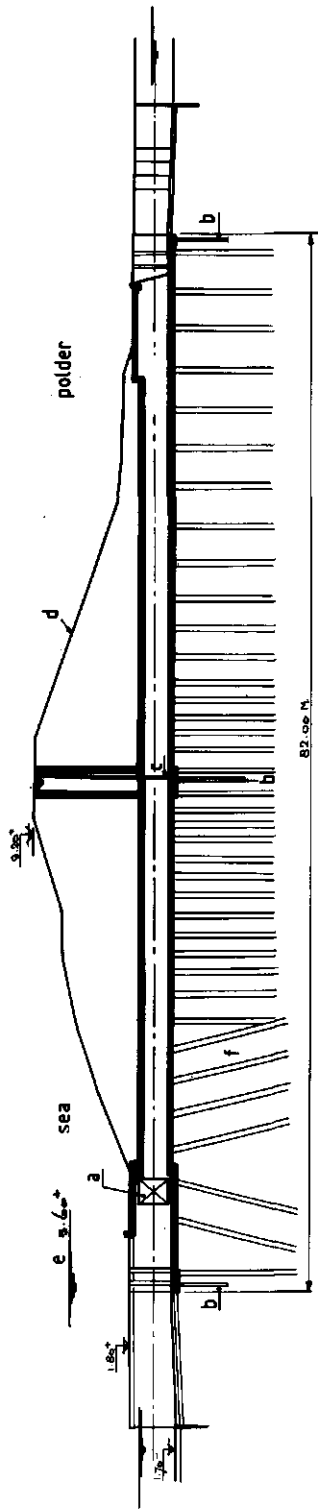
CONCRETE CULVERT SLUICE. (longitudinal section)
